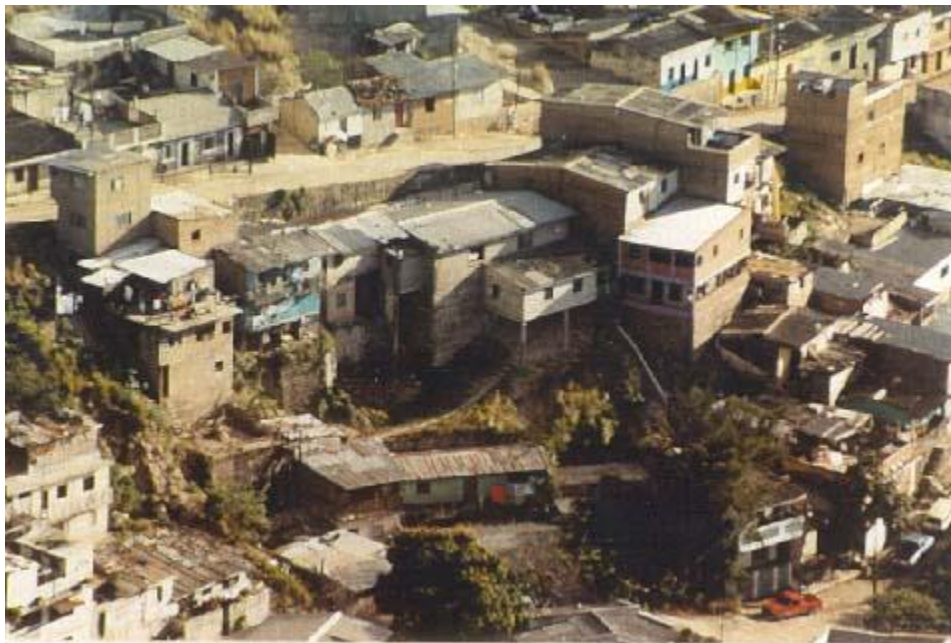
Damage Inspection, Choluteca, January 1999: Many Houses Destroyed by Flooding and Landslides
